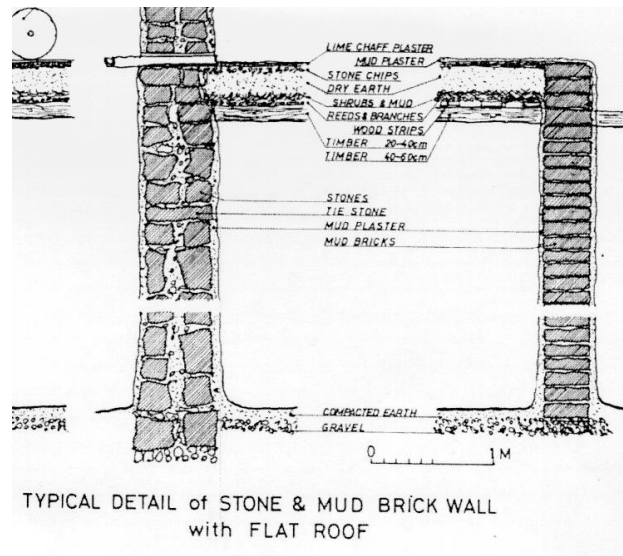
Sections in Damascene house illustrates the details in the wall and roof (Url-14).
